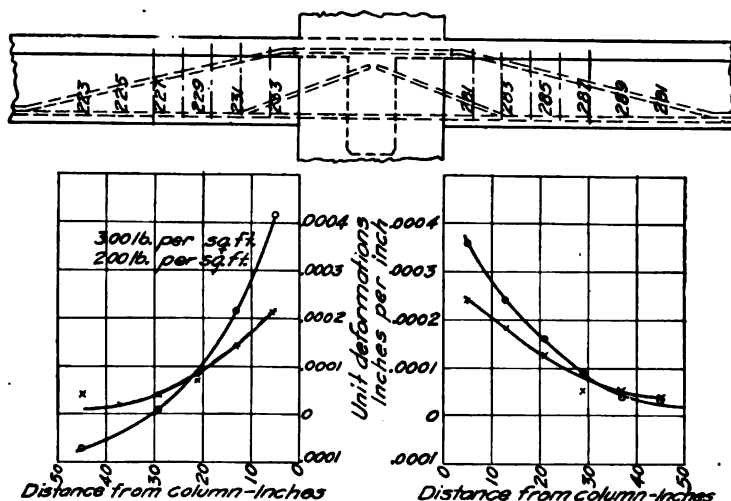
DISTRIBUTION OF COMPRESSIVE DEFORMATION IN BOTTOM OF COLUMN BEAM, TURNER-CARTER BUILDING.
